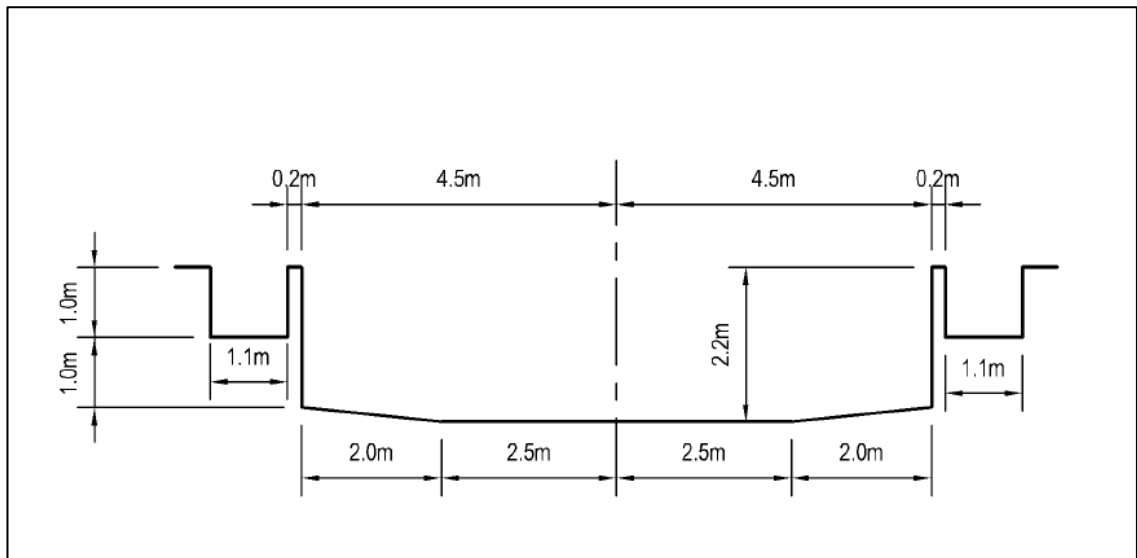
Indicative OSD Channel Section for Onsite Detention (Concept Plan 12/08/2011)
